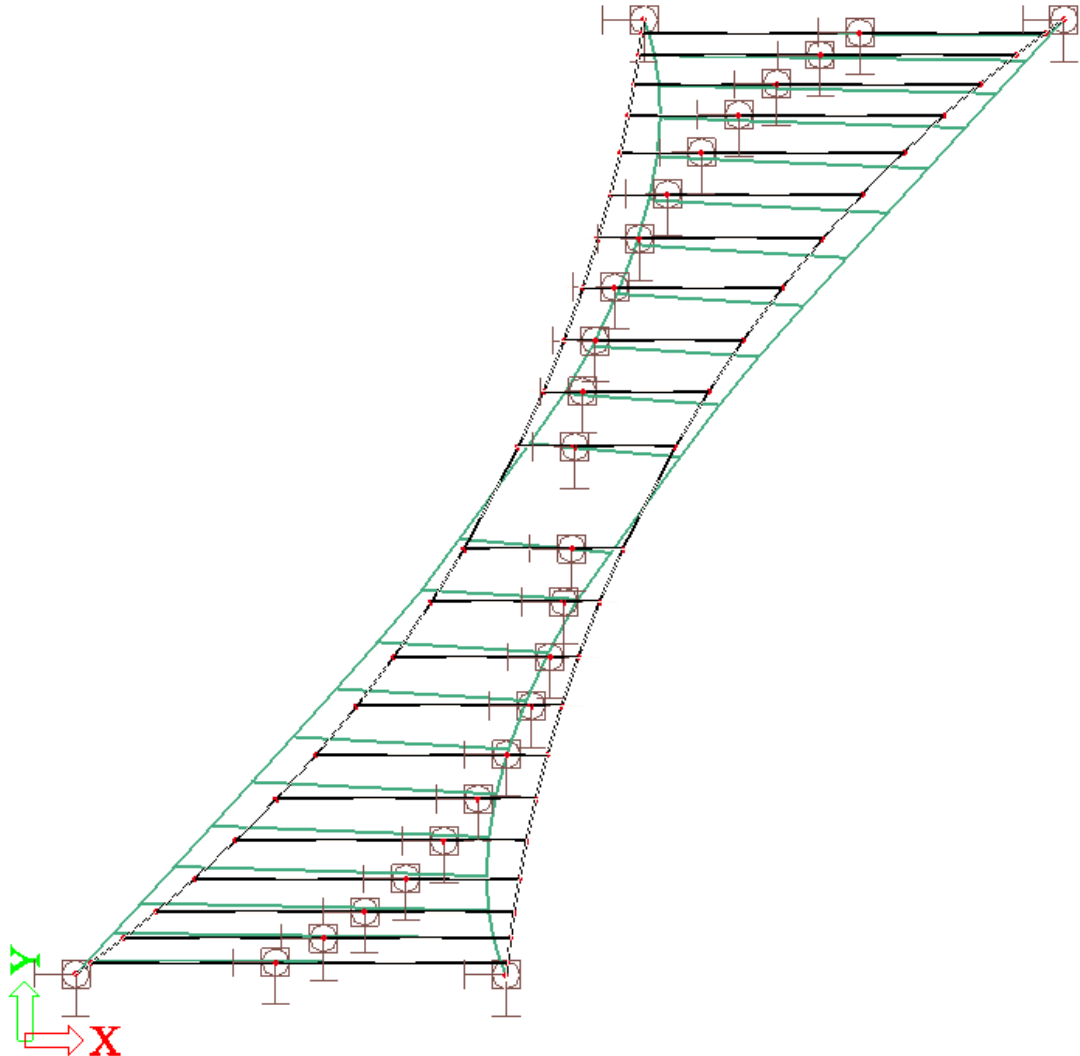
DEFORMED STRUCTURE TOP VIEW/ X-Y PLANE
